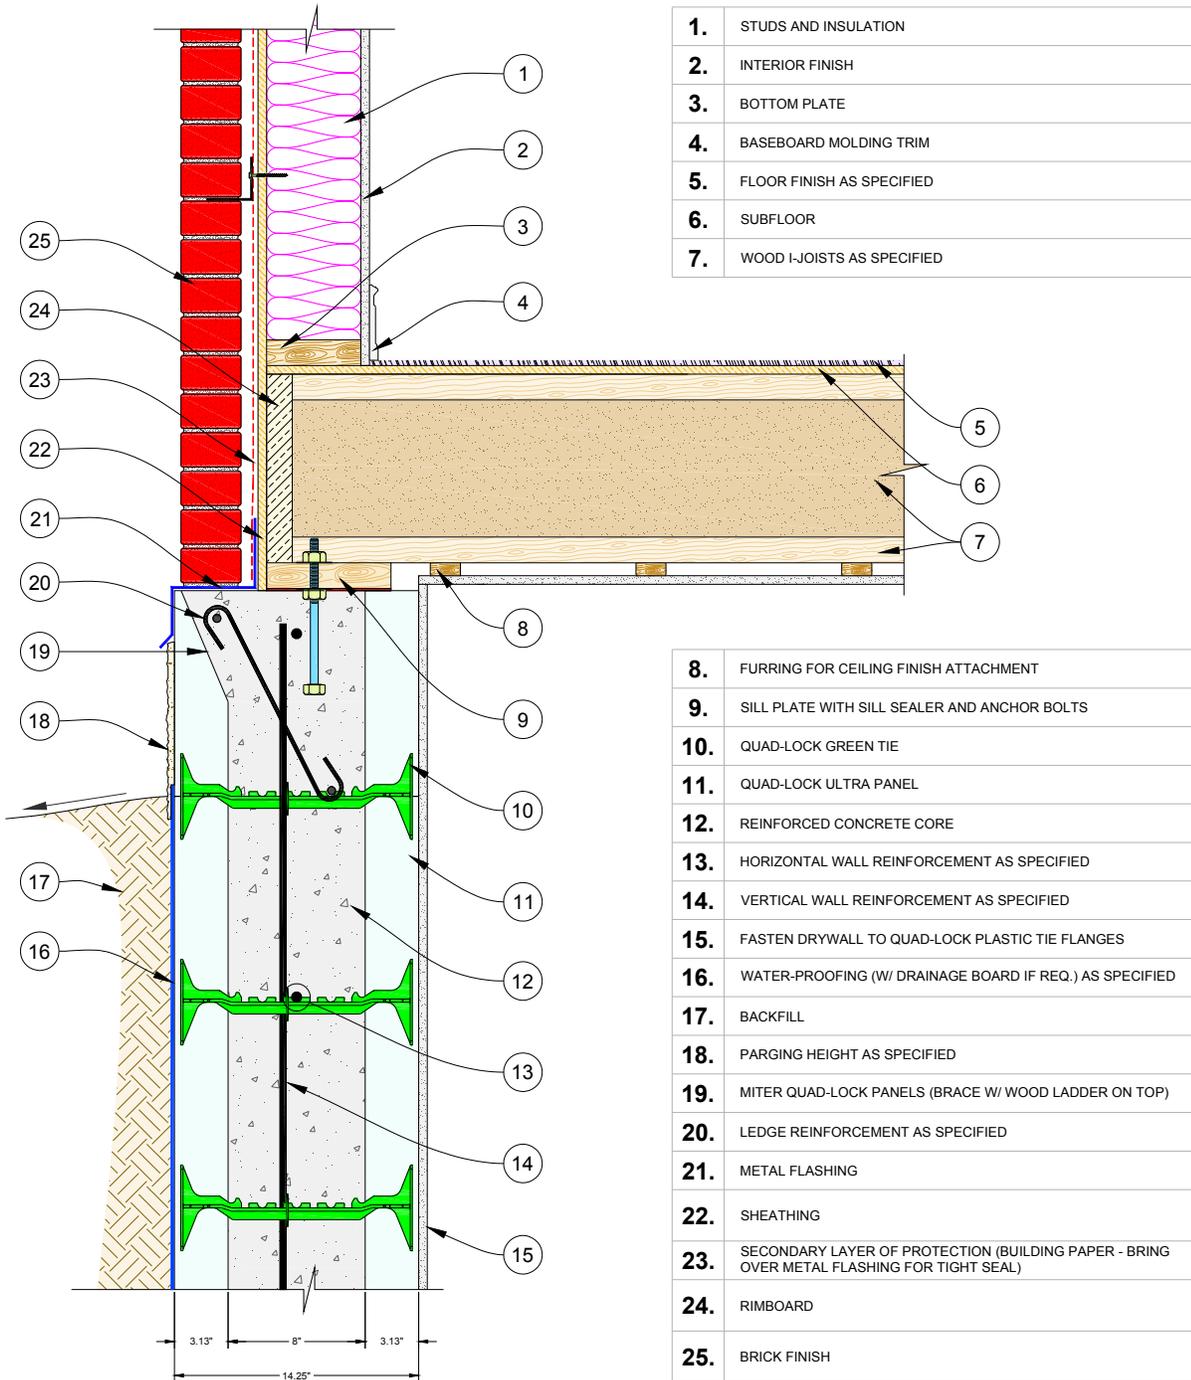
Quad-Lock Wall Tapering out at Top to Provide Support for Brick Finish
